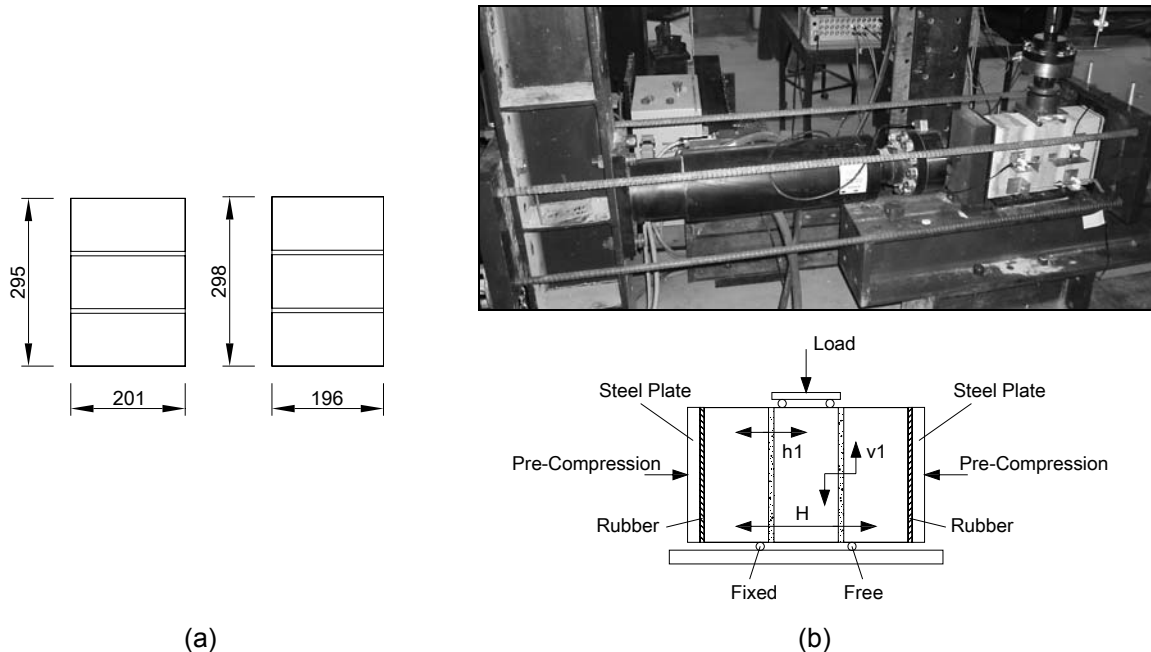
Initial shear tests: (a) Geometry of specimens and (b) Test setup.
